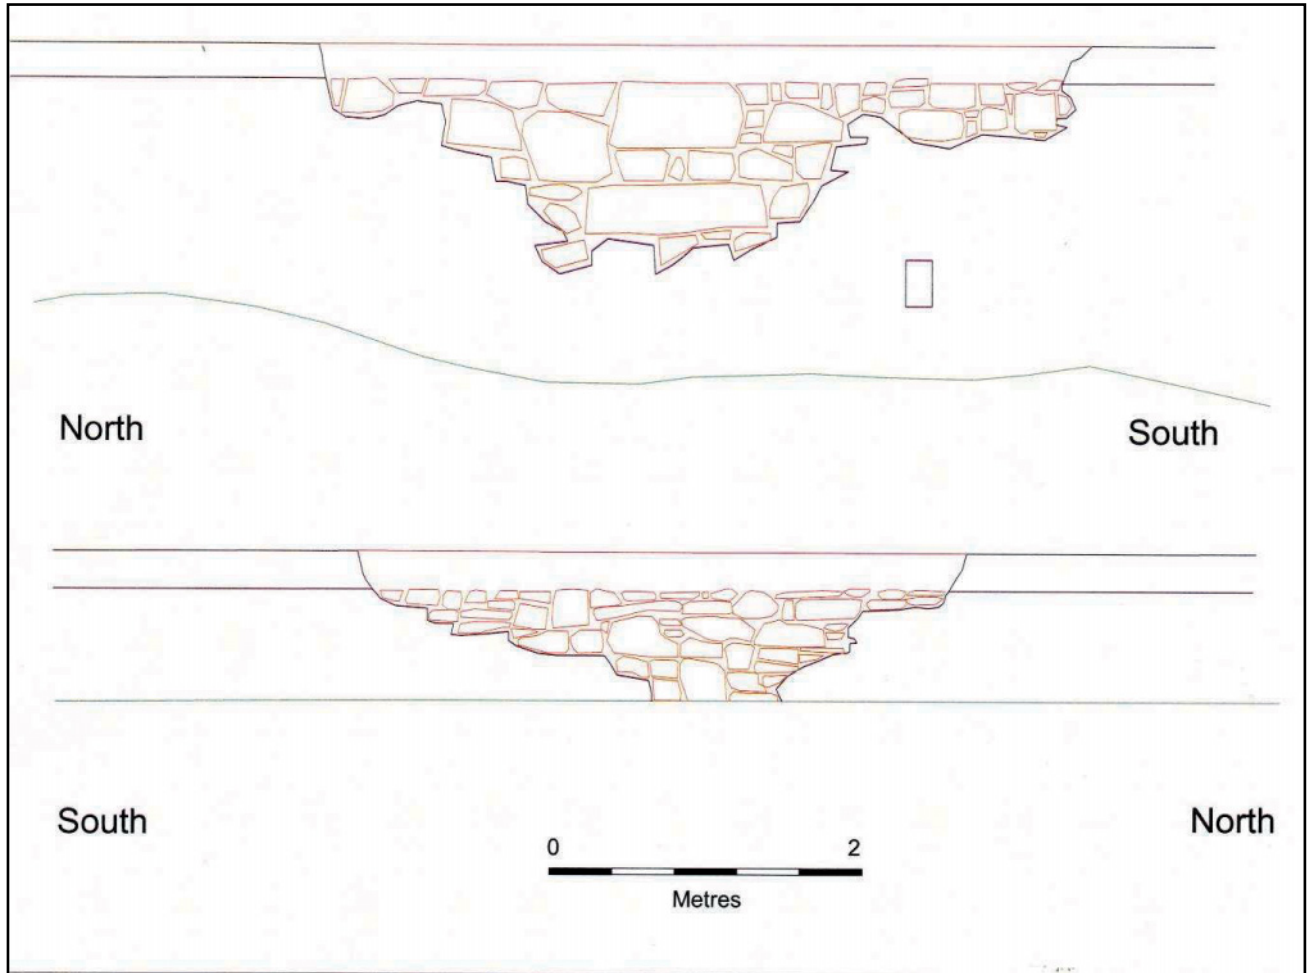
Elevations of the western parapet of the bridge, drawn by Adam Sharpe: above, the exterior face and below, the interior
